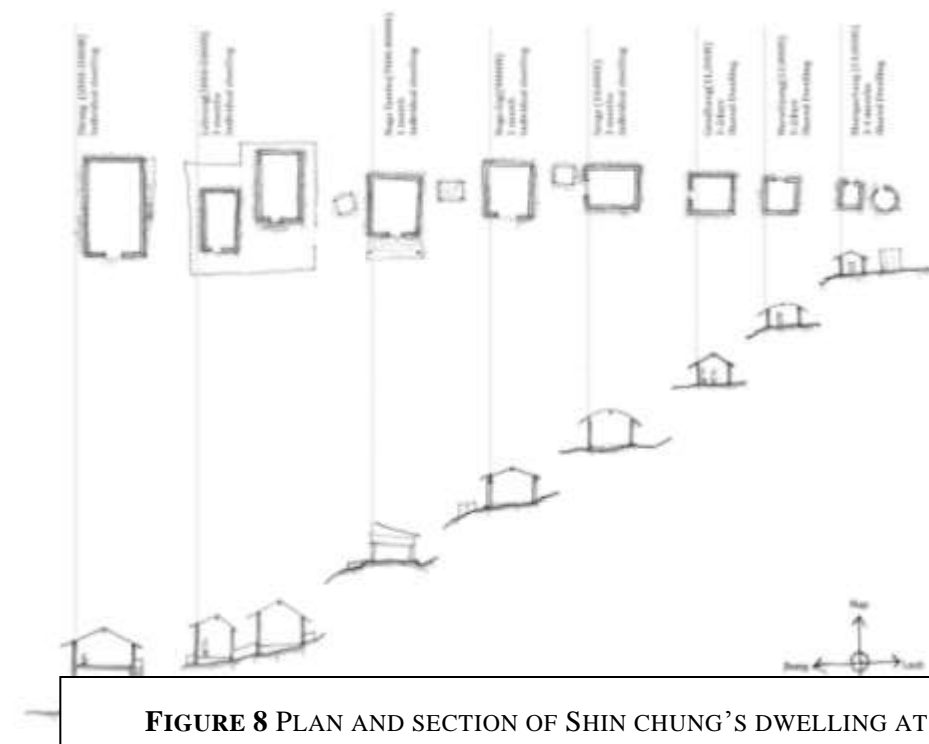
PLAN AND SECTION OF SHIN CHUNG'S DWELLING AT EACH ELEVATION.
